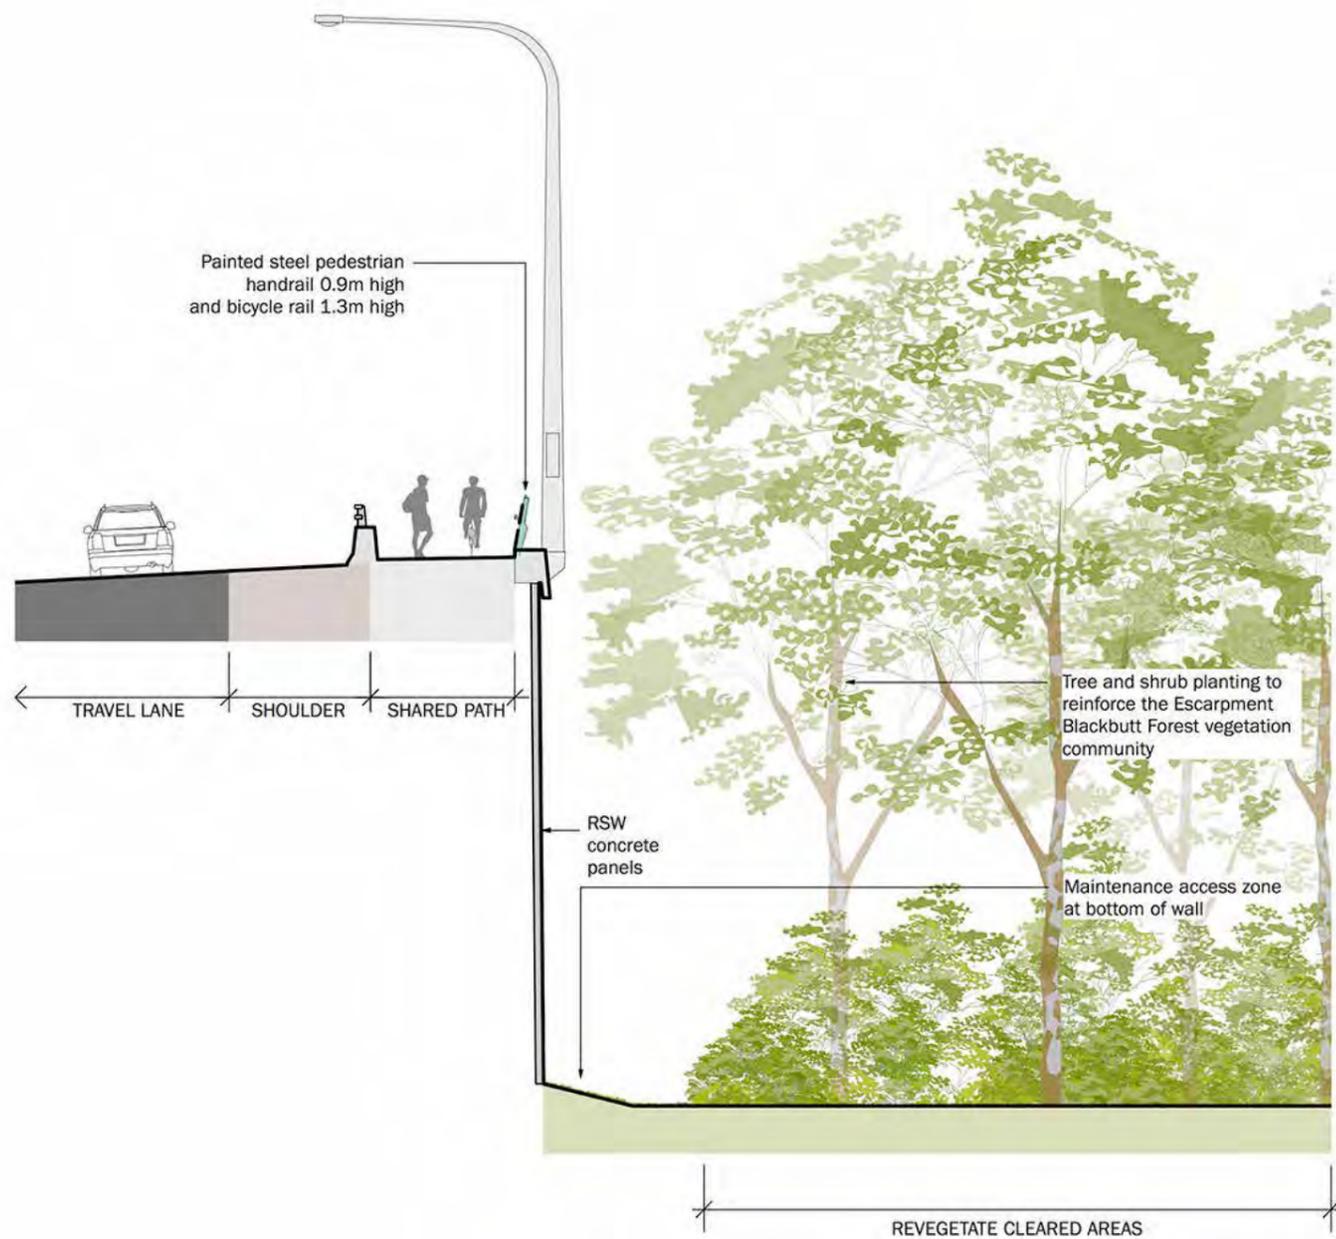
Typical elevation of retaining walls partially or fully screened from view - Finish type RW-F3 (Scale 1:150)
